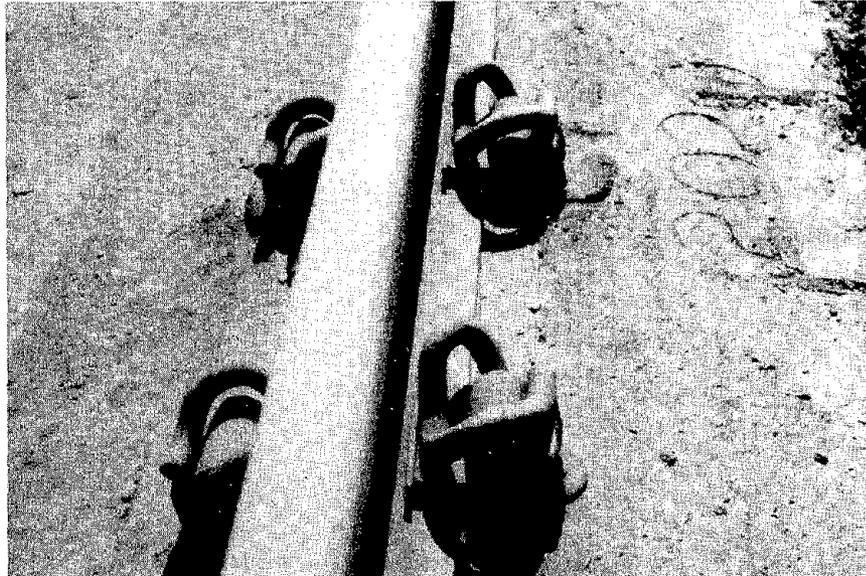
ADDITIONAL FASTENERS INSTALLED BETWEEN
